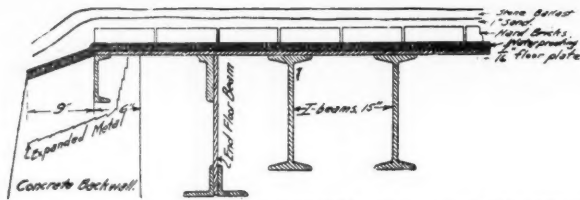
C. R. R. OF N. J. METHOD OF WATERPROOFING BRIDGE FLOORS.
